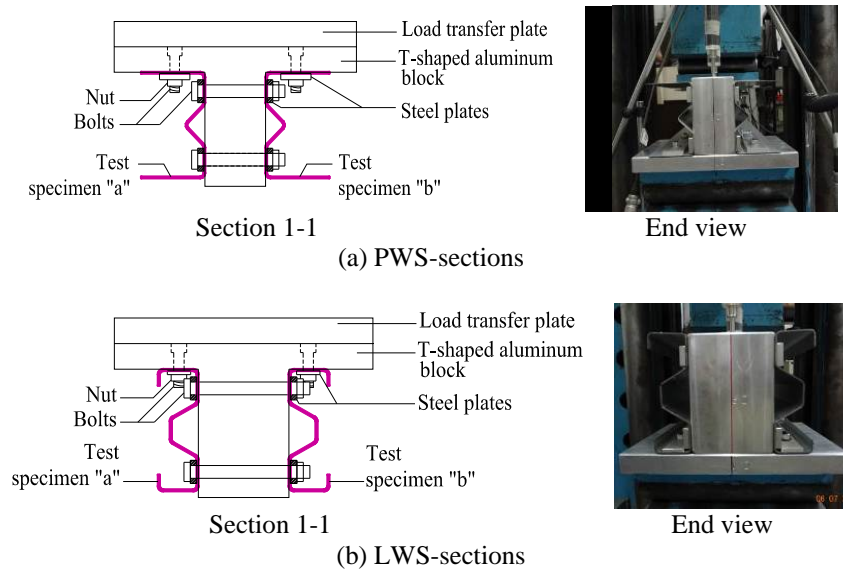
Details of the T-shaped aluminum load transfer blocks at loading points and end supports
